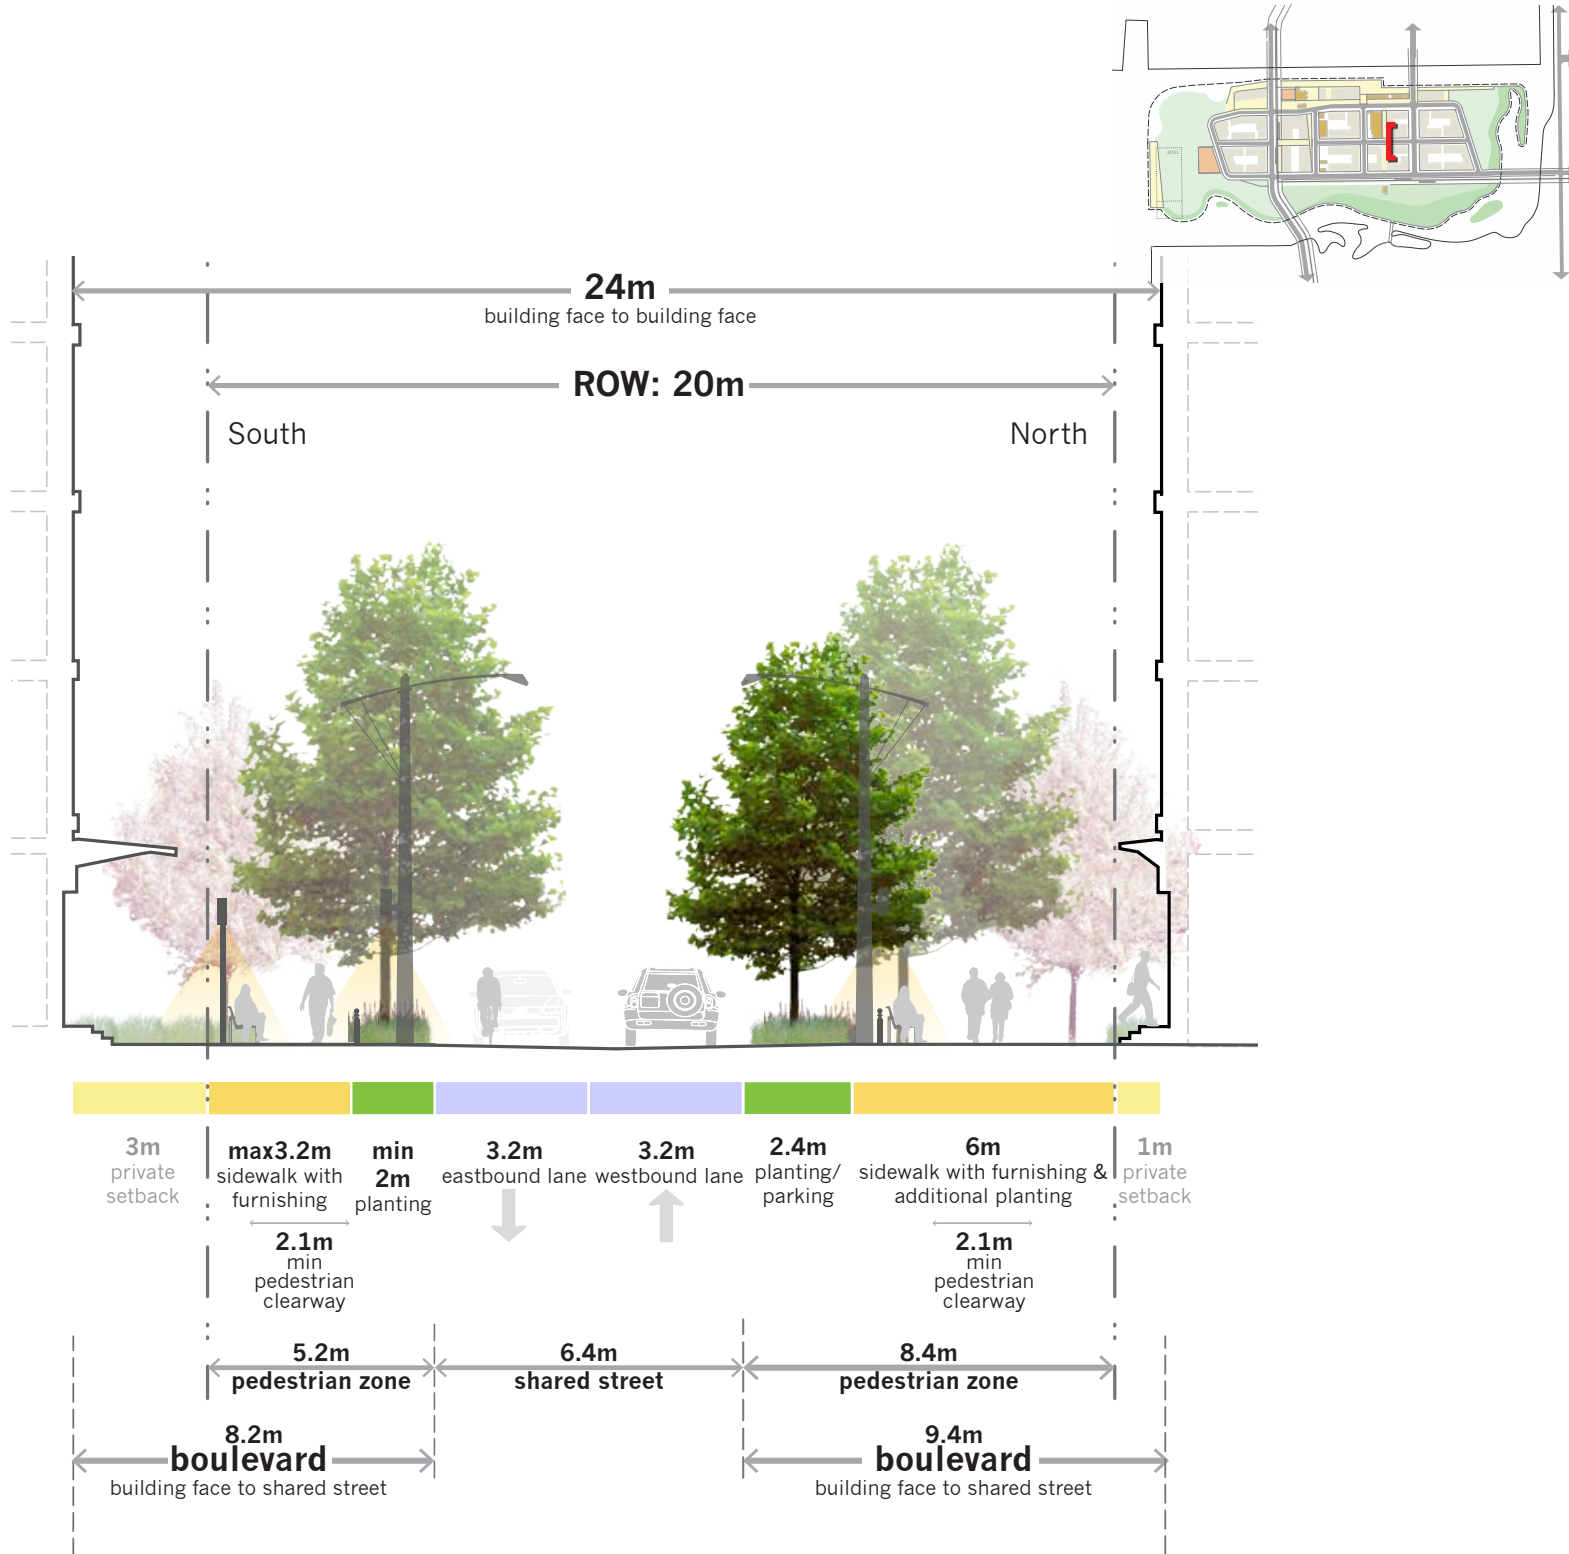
Typical Centre Street cross section with wider plantings and boulevard
